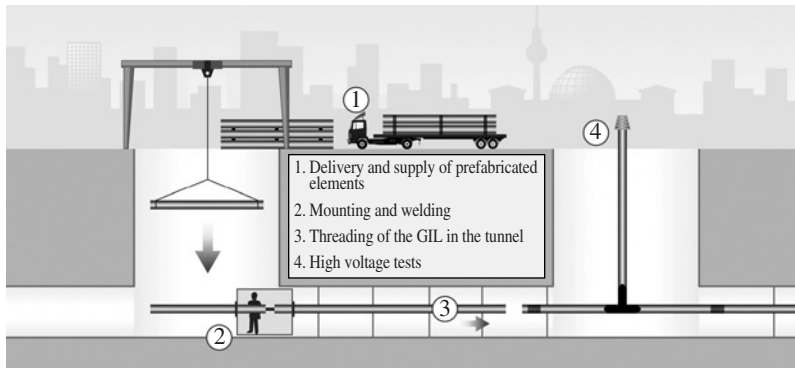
Laying and testing in a tunnel. (Courtesy of Siemens.)
